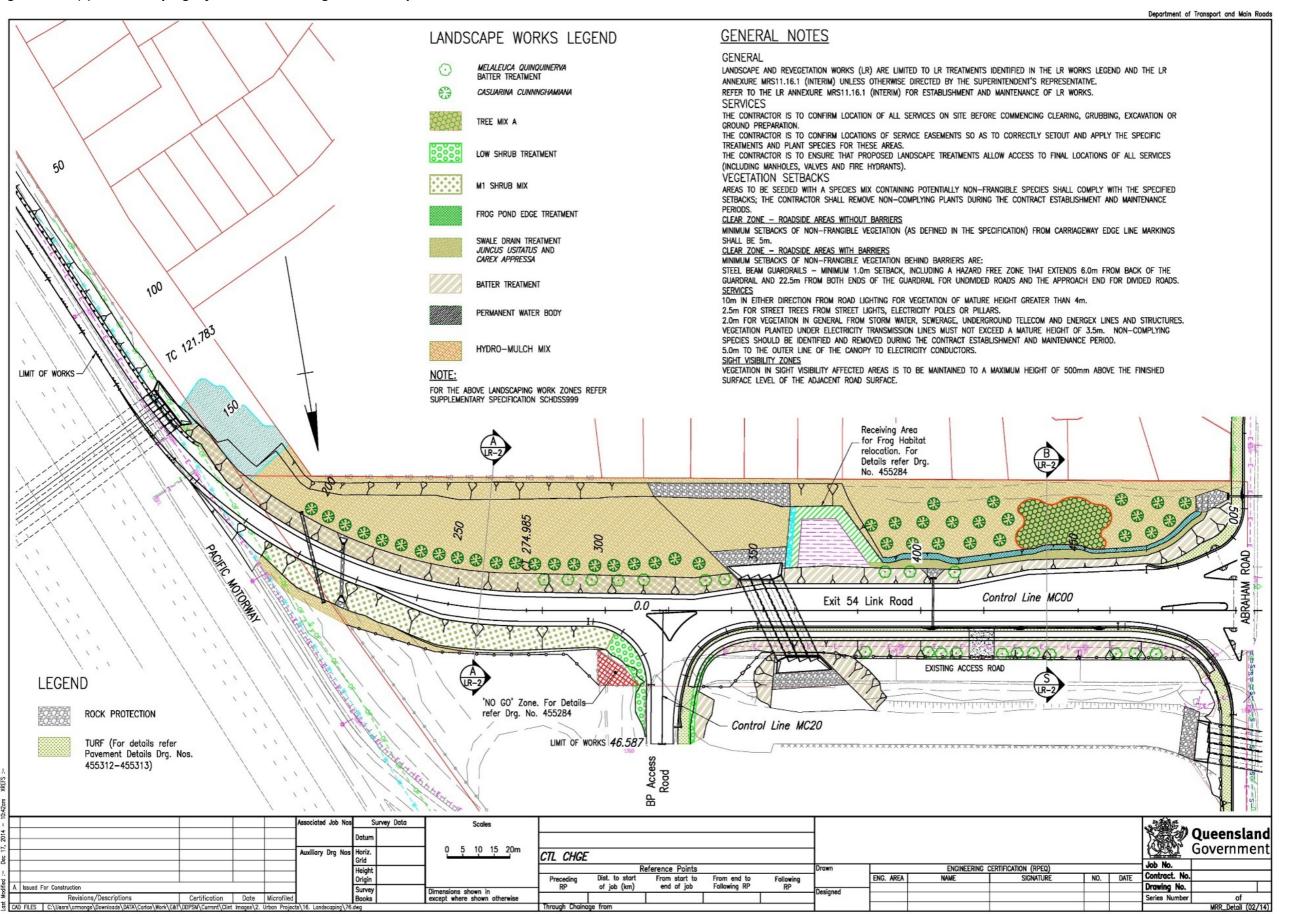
(f) – Landscaping layout and details – generic example 6
